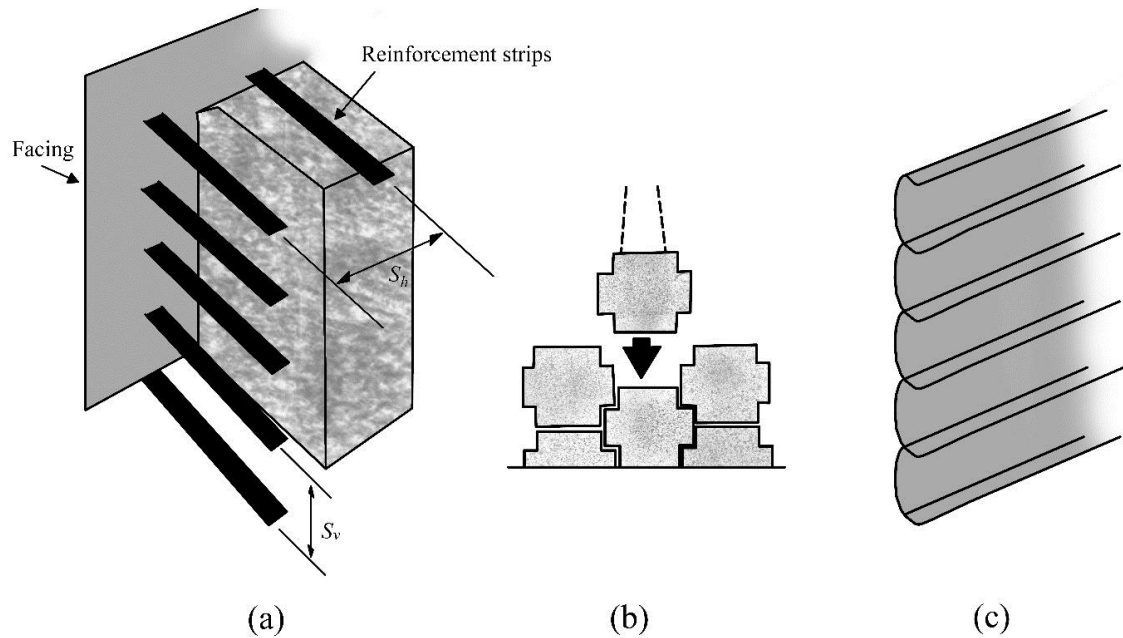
Simple schematic view of a reinforced earth wall (a) MSE wall; (b) cross-shaped modular facing; (c) steel sheet facing.
